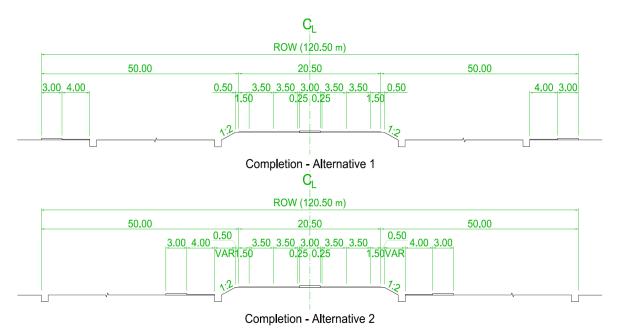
Typical Cross Sections for Nampula Southern Bypass Road (At Completion)
